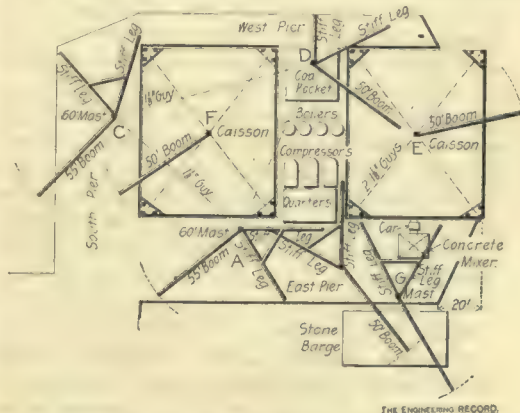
PLAN OF BROOKLYN CAISSONS.
